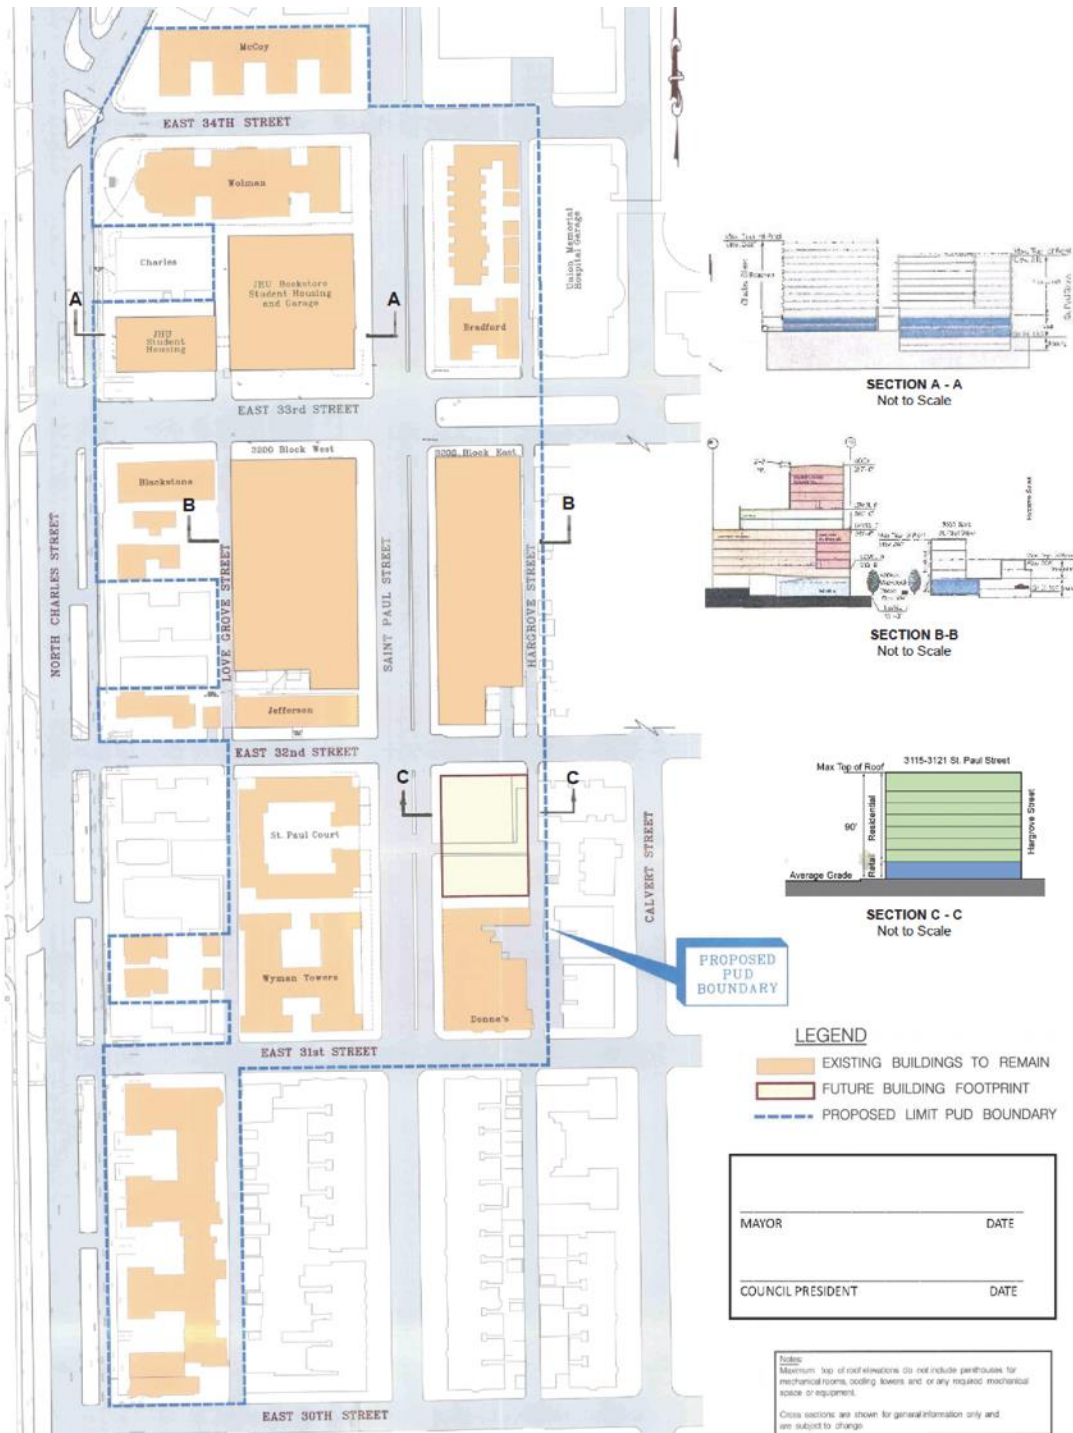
Clip of the North Charles Village PUD Sheet 3 of 4, “Preliminary Built-out Plan”, proposed revision, October 2023. Note the section C – C has been added and the PUD boundary has changed.
